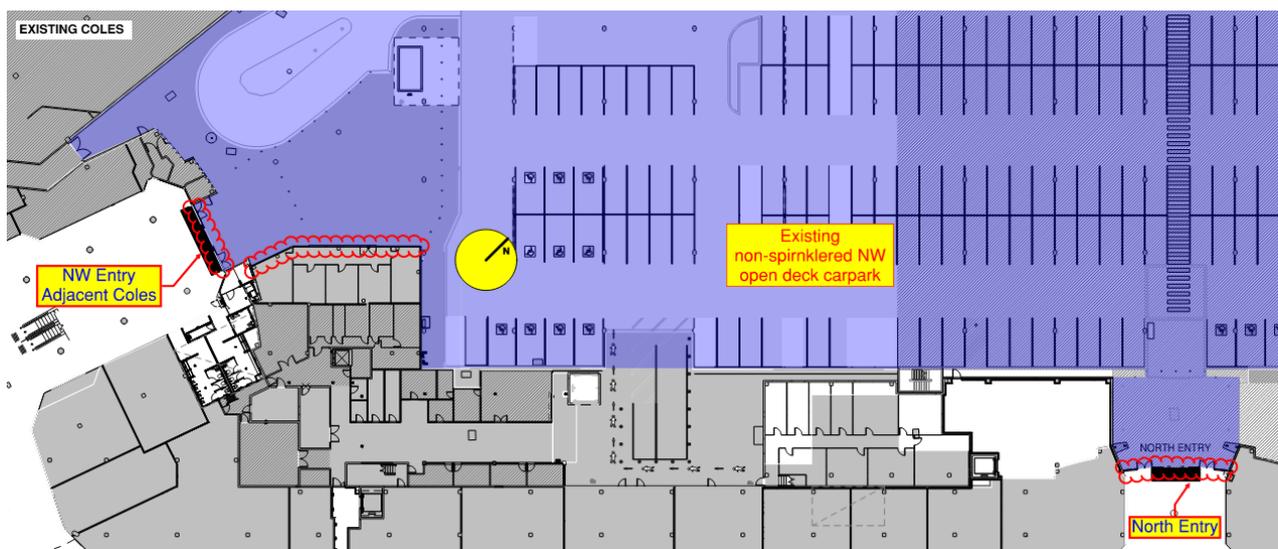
Locations where the walls between the sprinkler protected retail parts of the centre and the open-deck carpark that is not sprinkler protected have glazed sections
